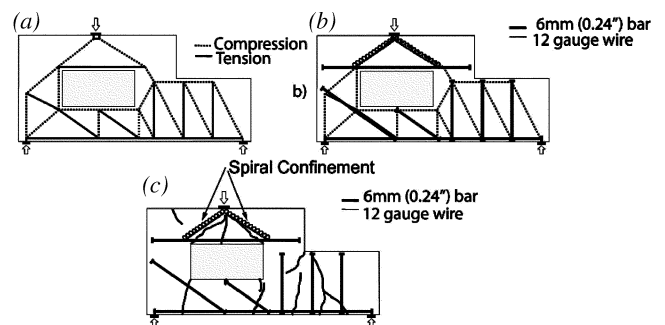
Specimen 2: (a) STM; (b) reinforcing layout superimposed on STM; and (c) crack pattern at failure superimposed on reinforcing layout.
